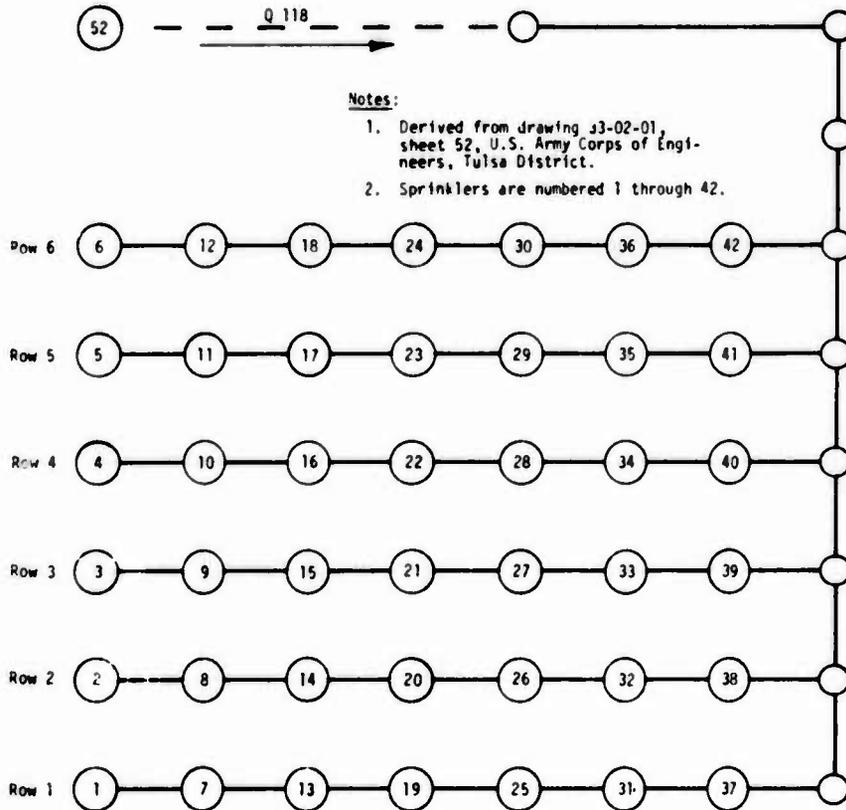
Sprinkler System in Building 416 at Tinker Air Force Base
